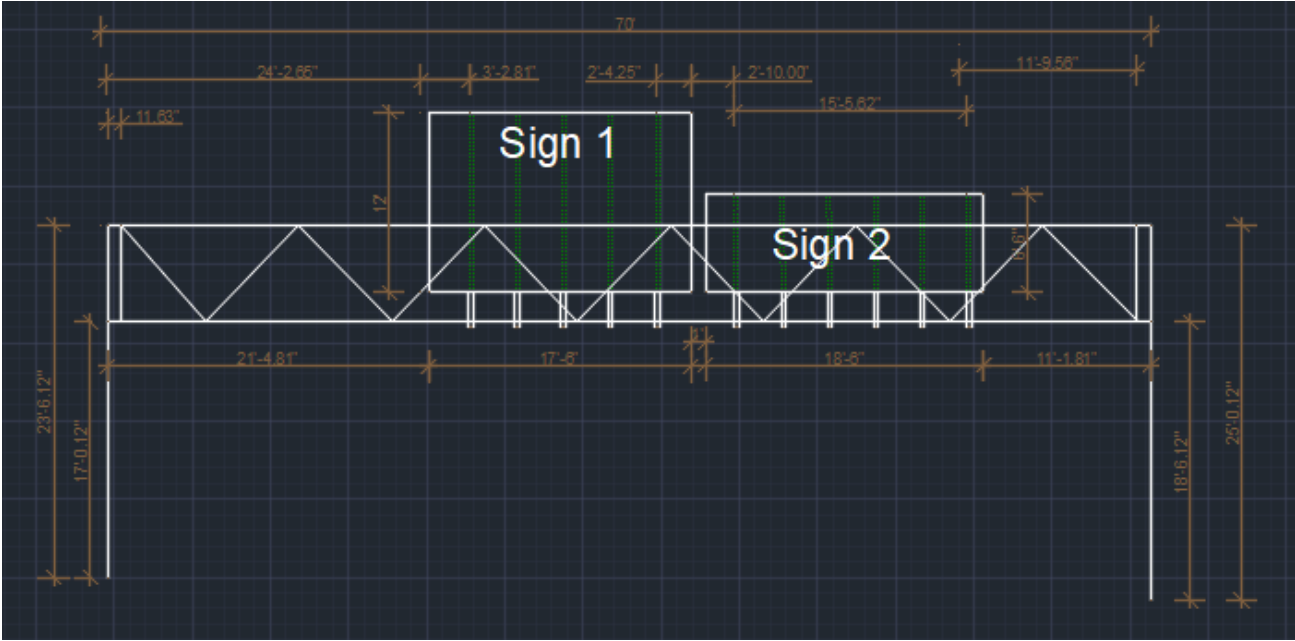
AutoCAD drawing of model 1 structure and its dimensions.
